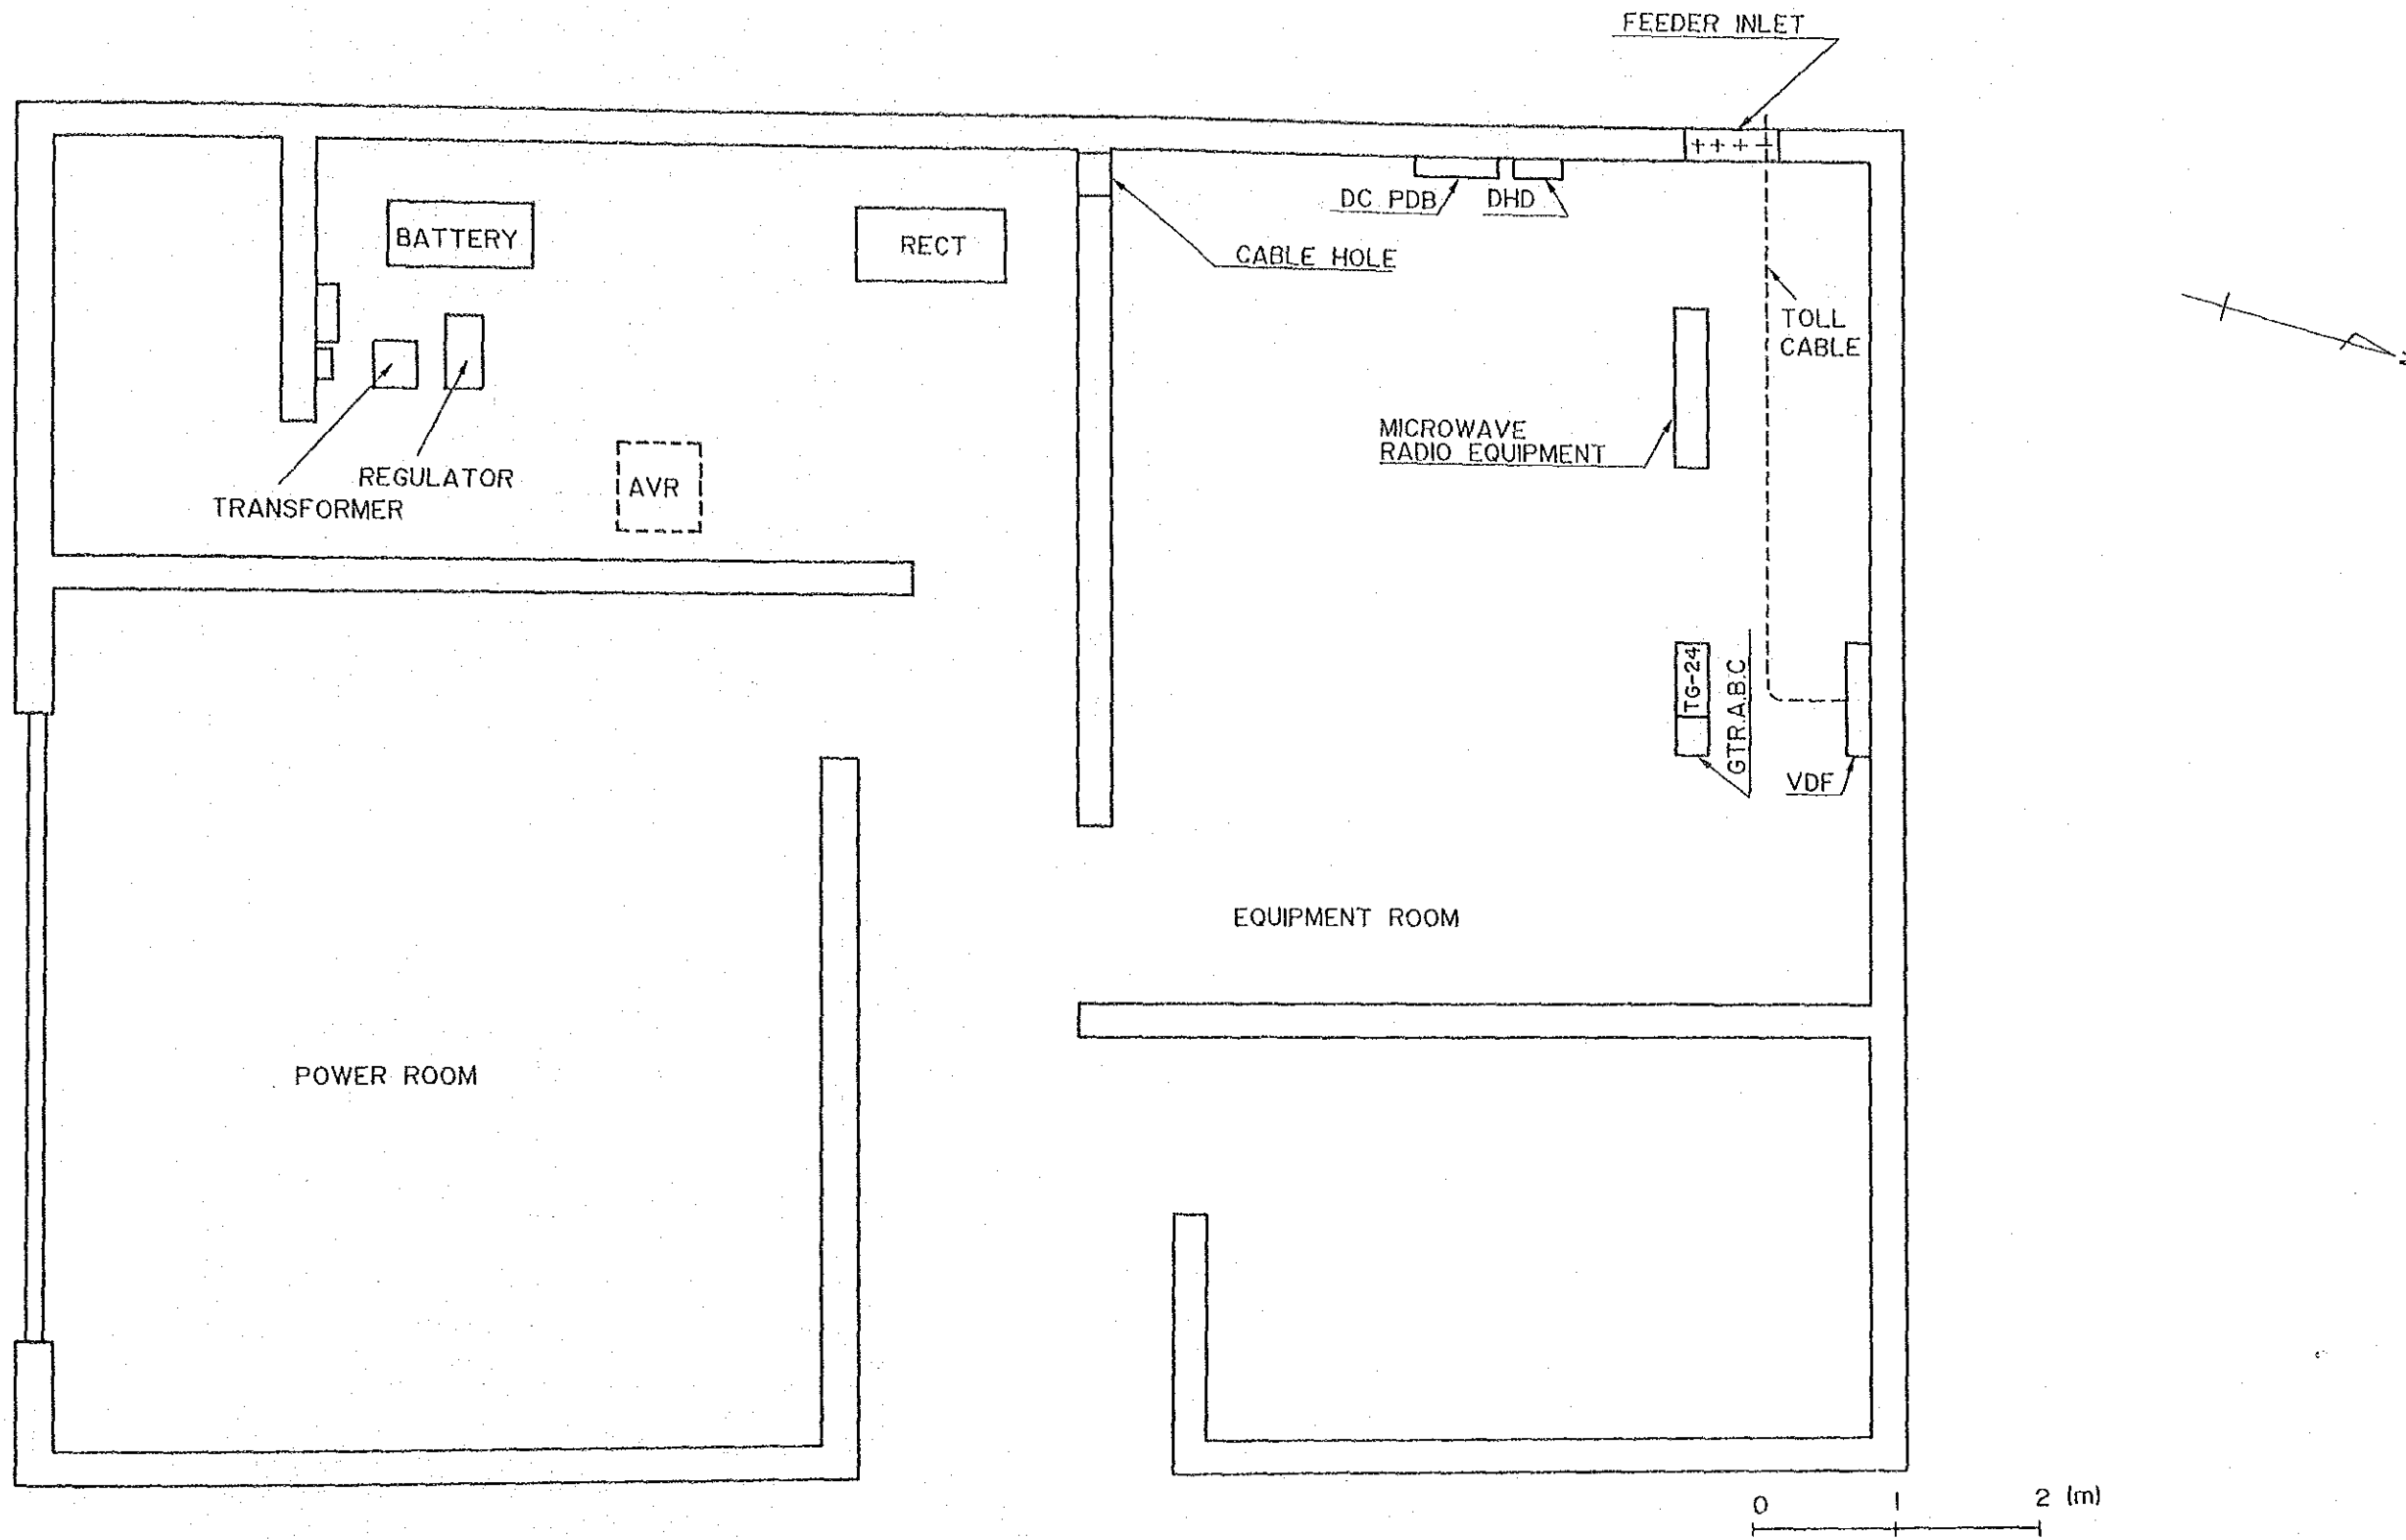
Floor Layout at Thaton Microwave Station
